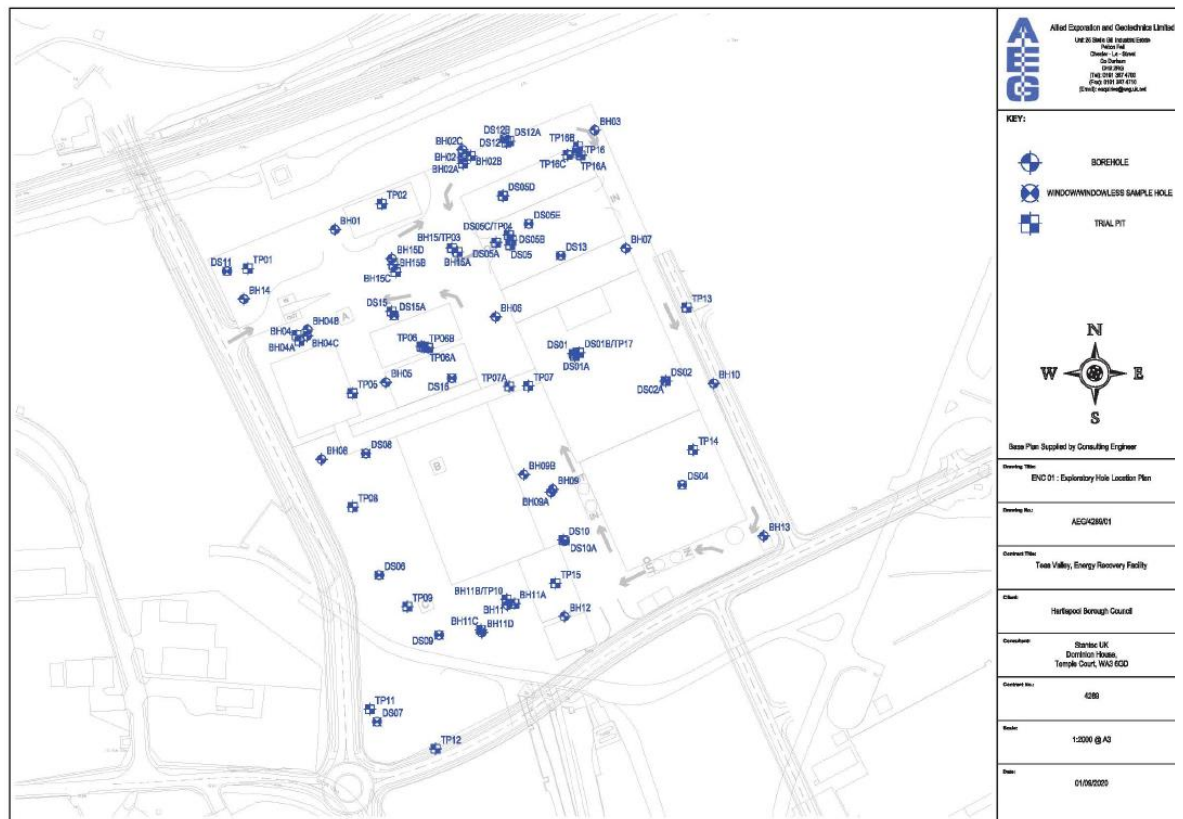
Borehole, sample hole and trial pit location plan (Source: AEG Prairie Site GIR 2020 in Appendix B)
